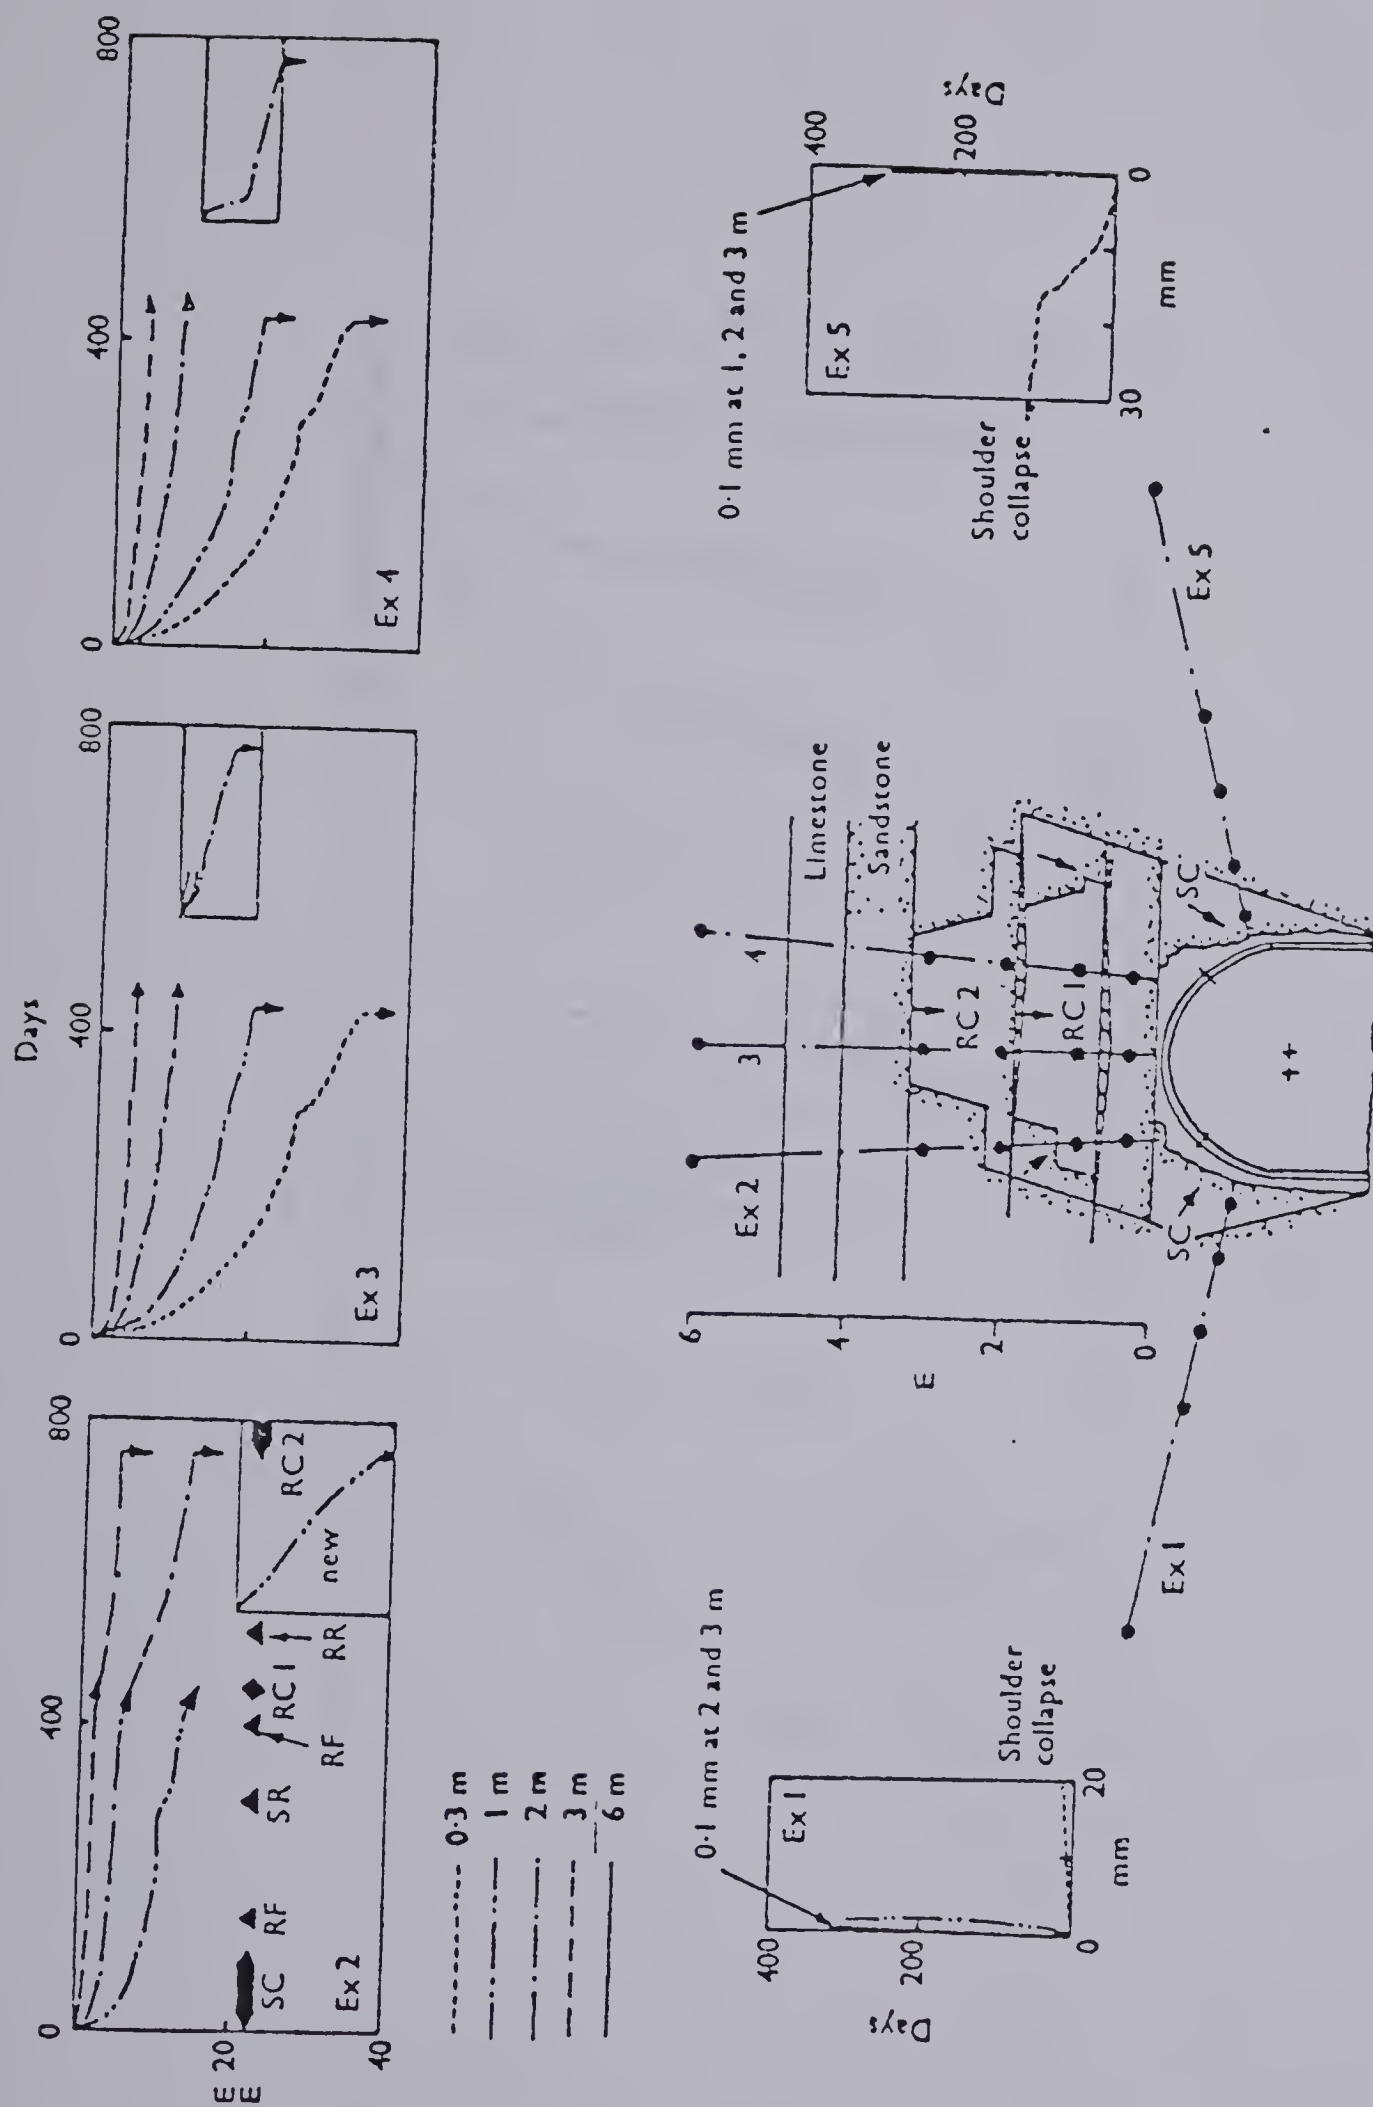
Layout of extensometers and progression of shoulder and roof collapses. Unlined section (Ward(1978))
